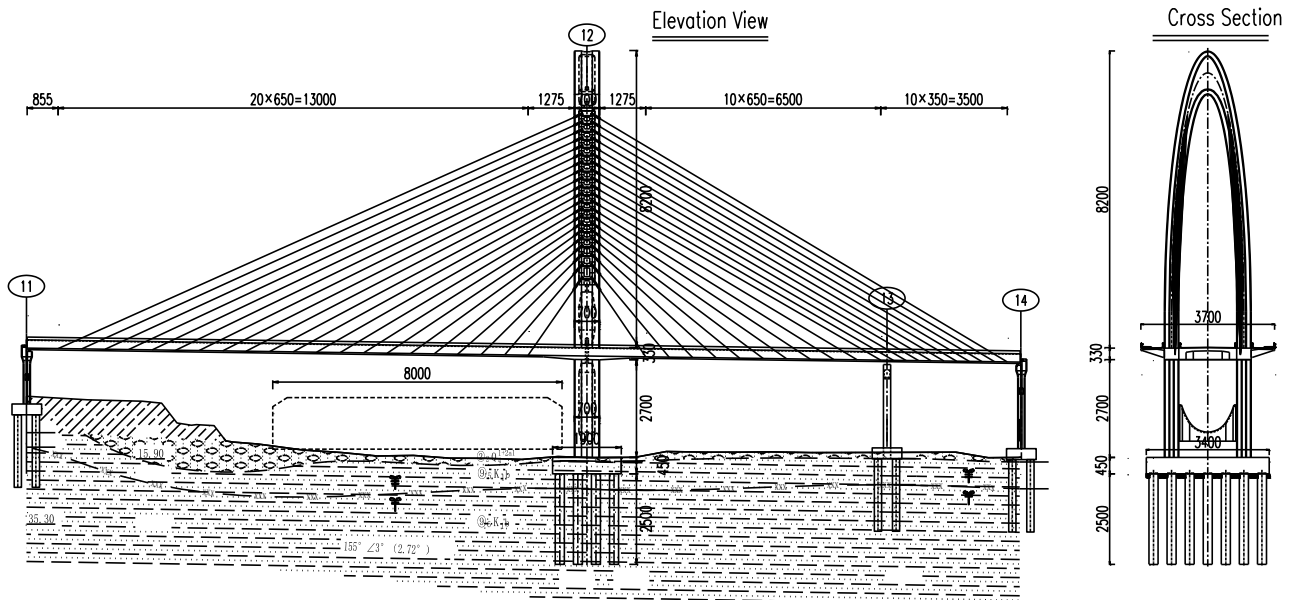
Schematic diagram of the bridge-type arrangement for the main bridge (Unit: cm)
